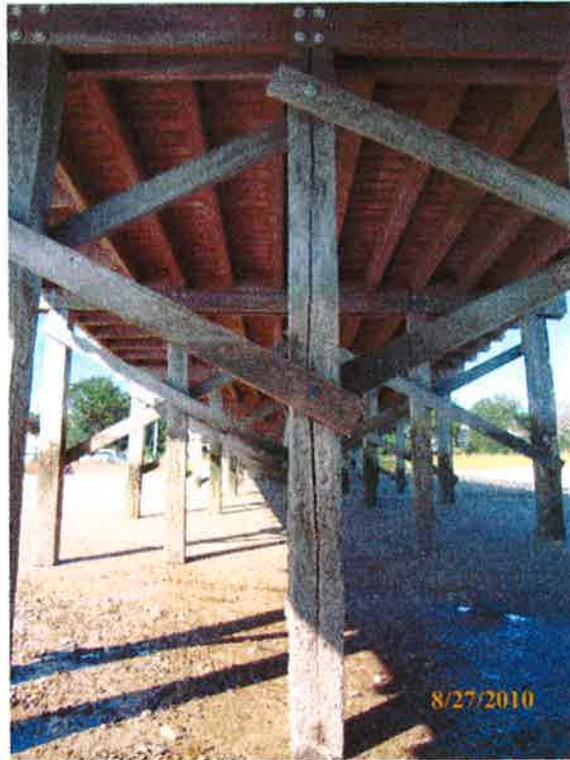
Bent #13, Pile "C", showing full height split to East face.
